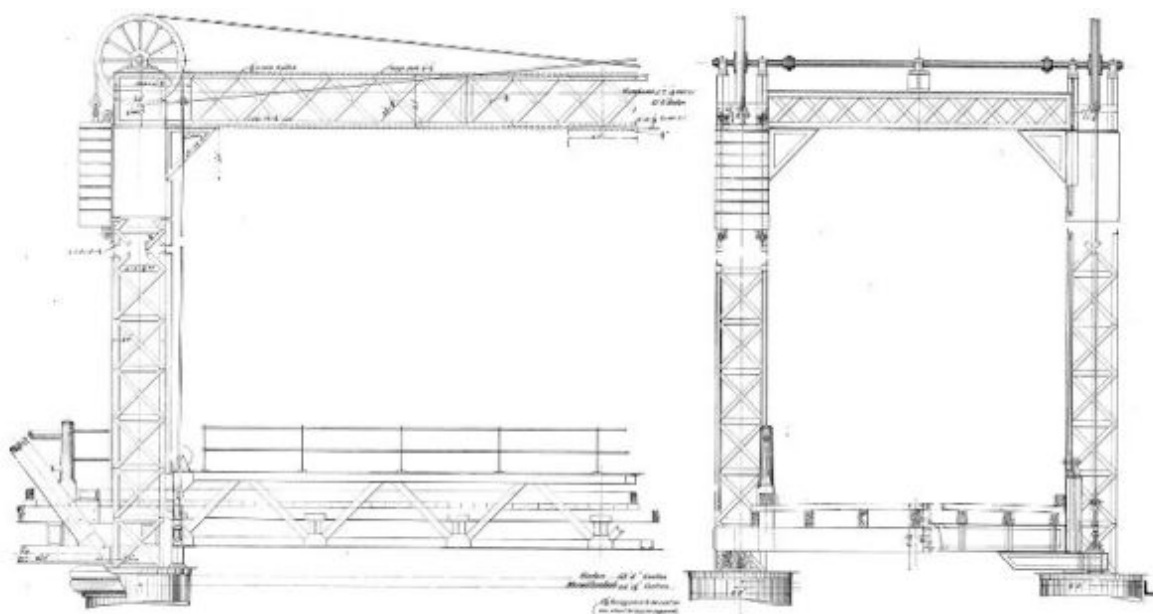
Drawing of lattice towers, transverse and longitudinal girders on Hinton Bridge
